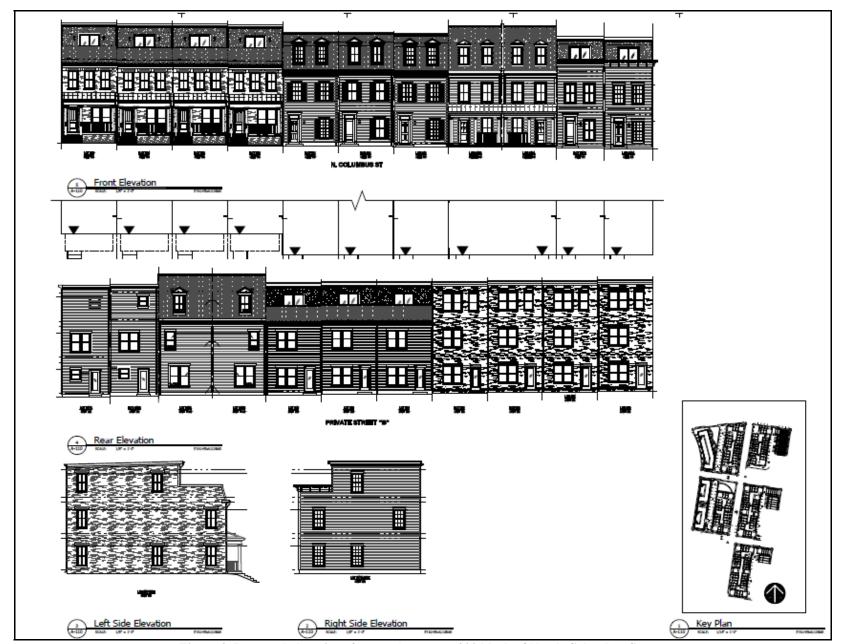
Proposed elevations for townhouses on 900 block of North Columbus Street.
